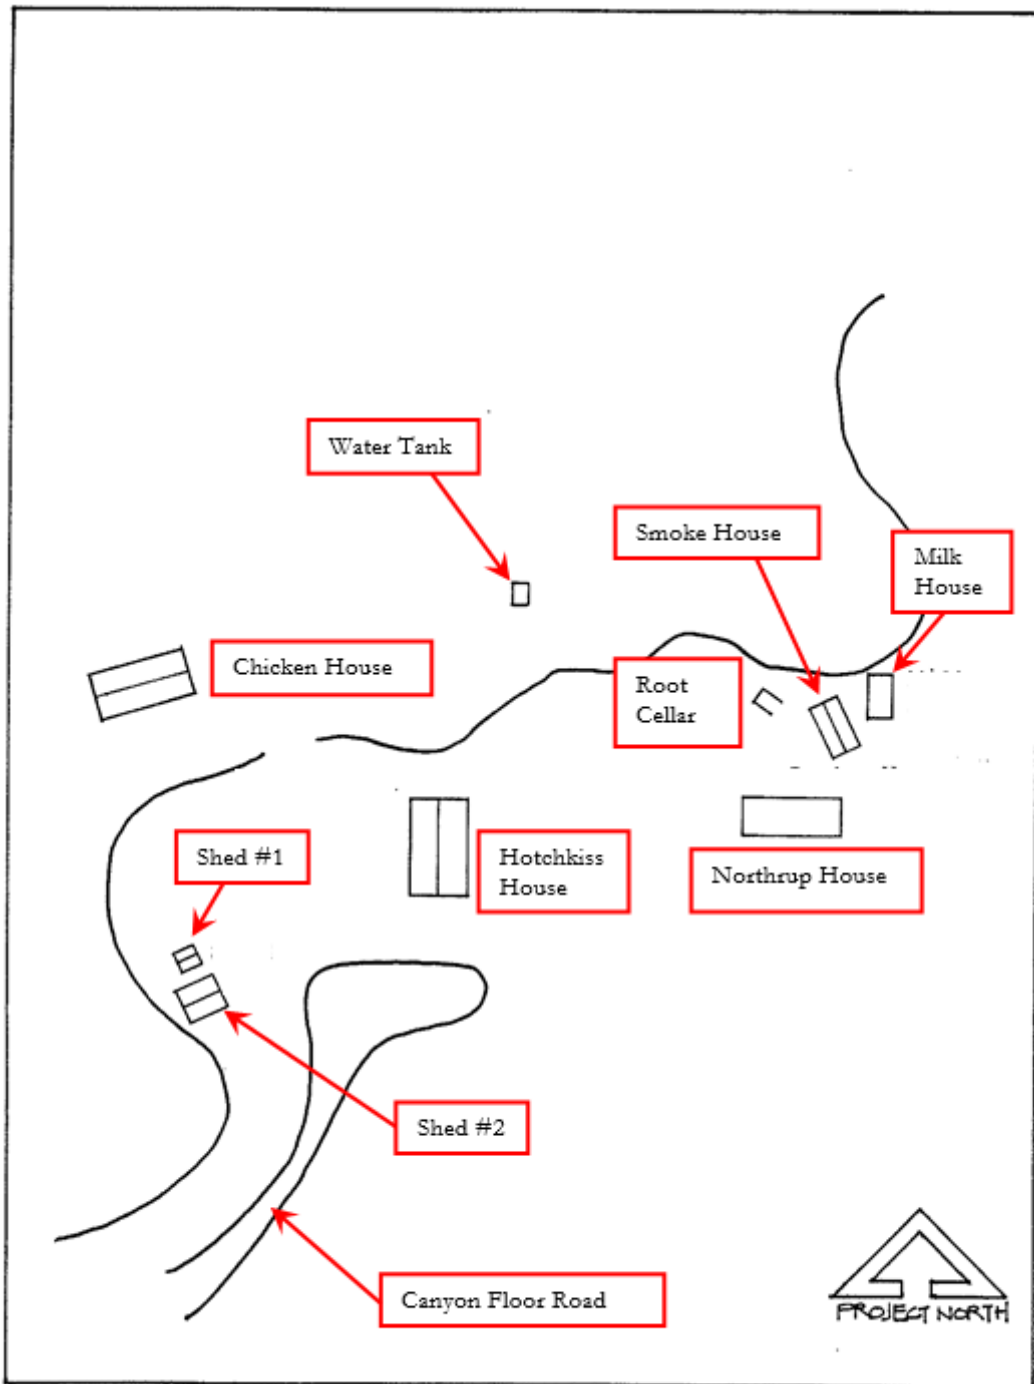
Site plan of the Northrup Homestead. The orchard and gardens lay east of the north end of the canyon floor road. Source: Washington State Parks (2010), Appendix 3.
